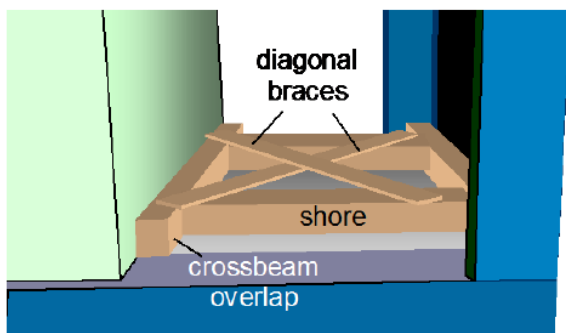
Shoring arrangement showing cross beam overlap and diagonal braces
